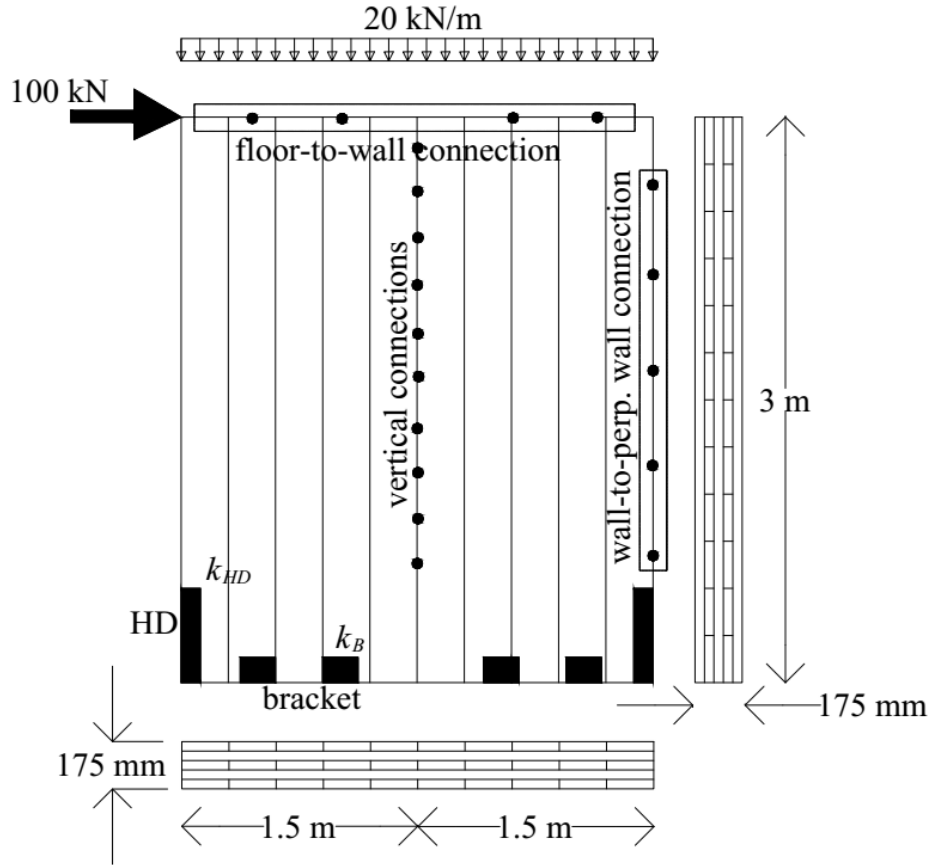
Geometry and properties of coupled CLT shear walls with 2-HDs connected to perp. wall and floor above
